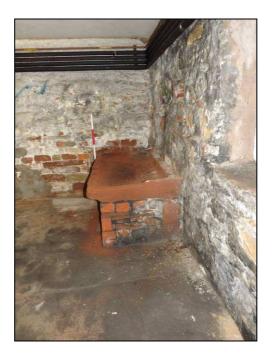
View looking north showing the sandstone 'trough' in Room B2
